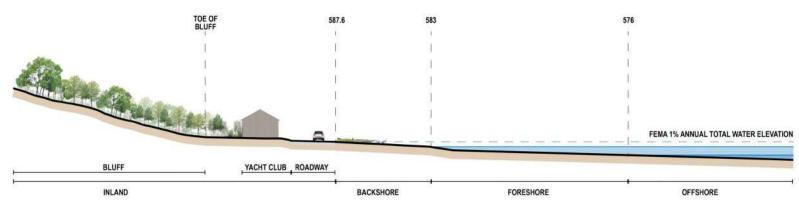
Cross Section of South Beach at Park Ave Boating Facility
